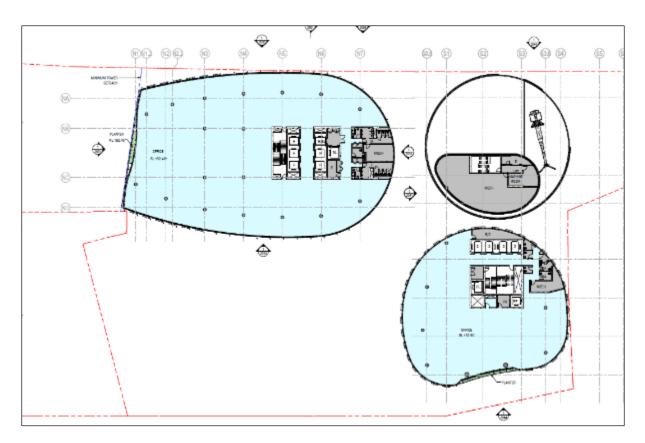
Level 35 Floor Plan and Typical Levels 34-37 High Rise Plan for South Tower
